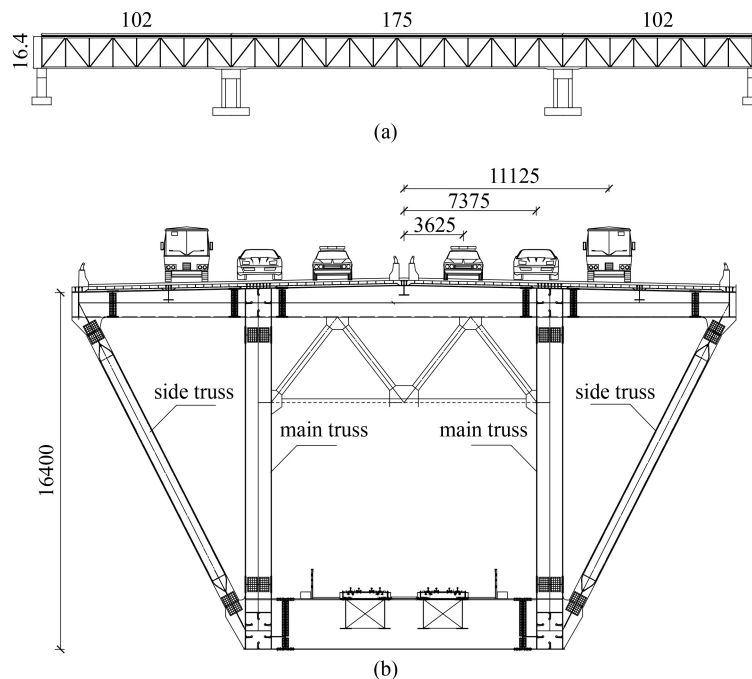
The Nansha Port Bridge: (a) elevation of the bridge spans (m); (b) cross-section of the bridge structure, showing lane arrangement (mm).
